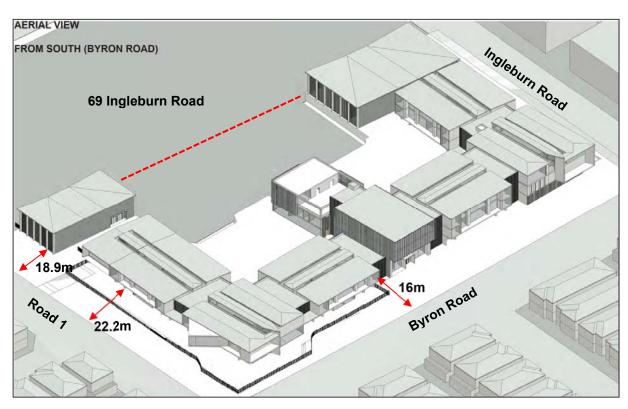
| Proposed built form (south-eastern corner) and setbacks (Source: Applicant's EIS 2019)
